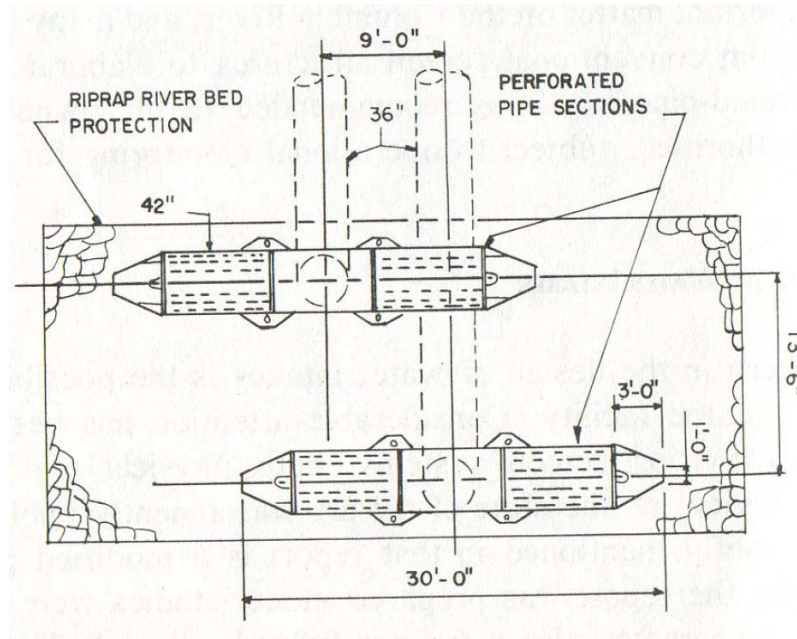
Plan View of Perforated Pipe Inlets [Ref. 6.101]
